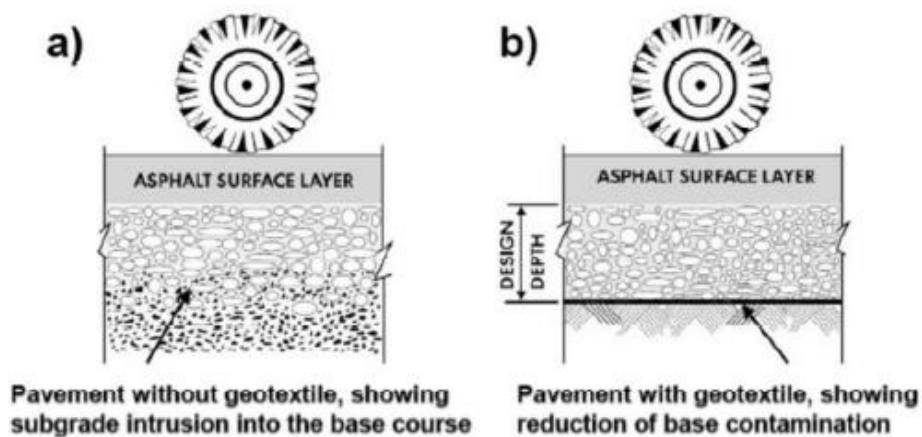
Schematic representation of a) a road pavement without a separation layer and b) pavement with a geotextile as a separator (Das SC *et al*, 2017).
